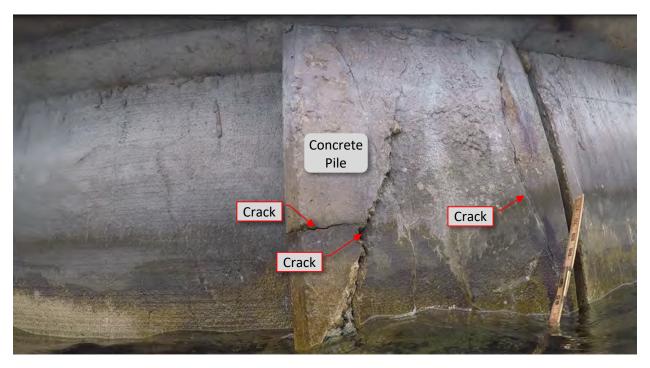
P40. STA 5+80. Cracks/spalls at both flanges at pile and loss of concrete. Gap at construction/expansion joint.
